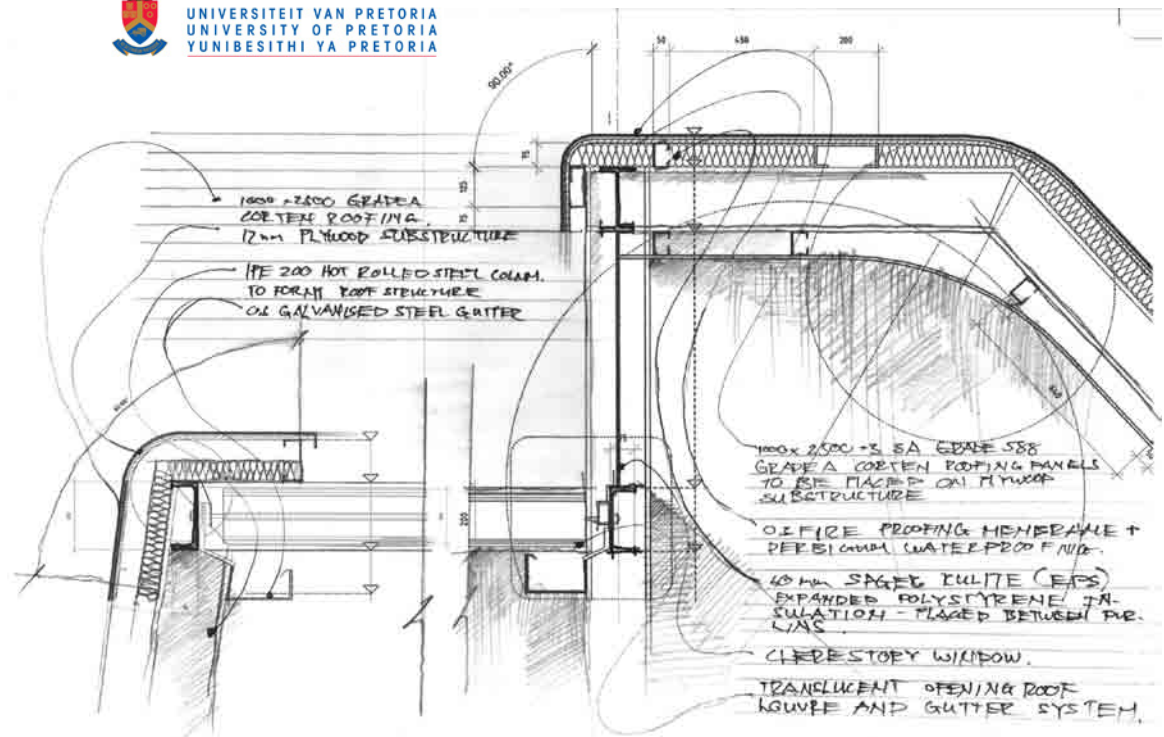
Detail of roofing system, nts (Author, 2011)
